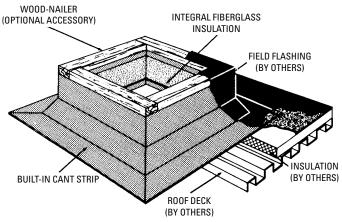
Prefabricated roof curb designed for flat-roof installation. (*Courtesy Penn Ventilator Co., Inc.*)
